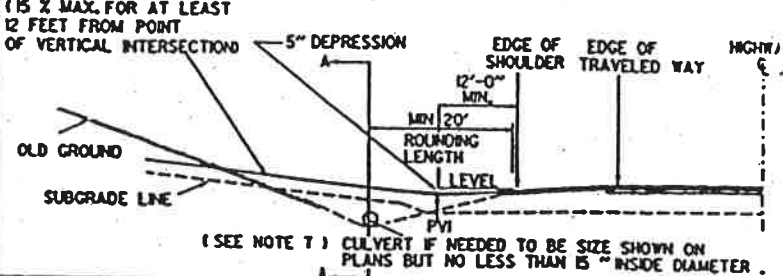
DETAIL I PROFILE OF DRIVE INTERSECTION (FILL SECTION)
